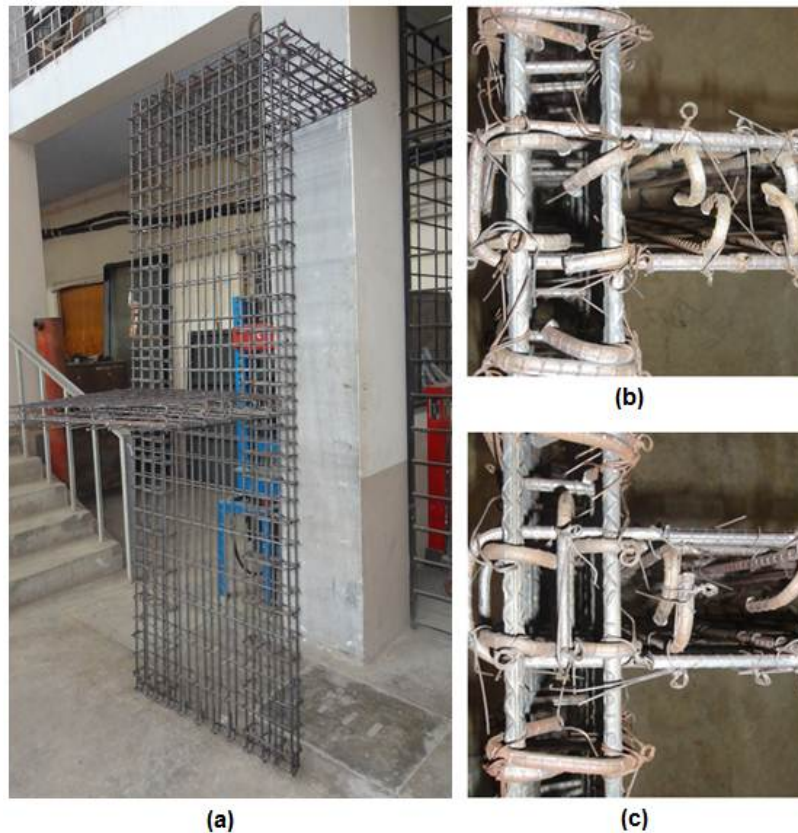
(a) View of reinforcement cage; (b) Joint detailing of test unit U; (c) Joint detailing of test unit A.
